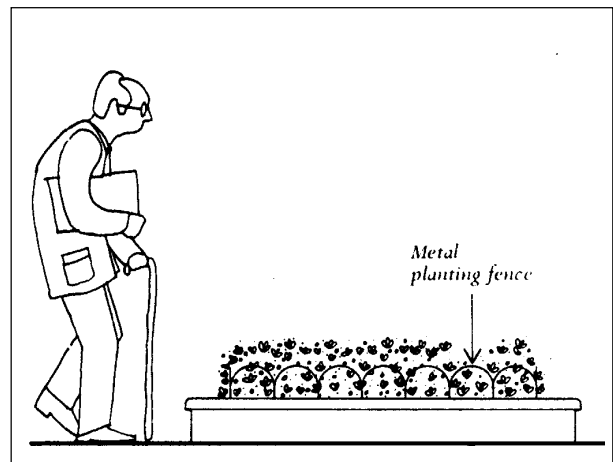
Fixed Planters – Side Elevation of Raised Planting Area Less Than One Foot in Height
